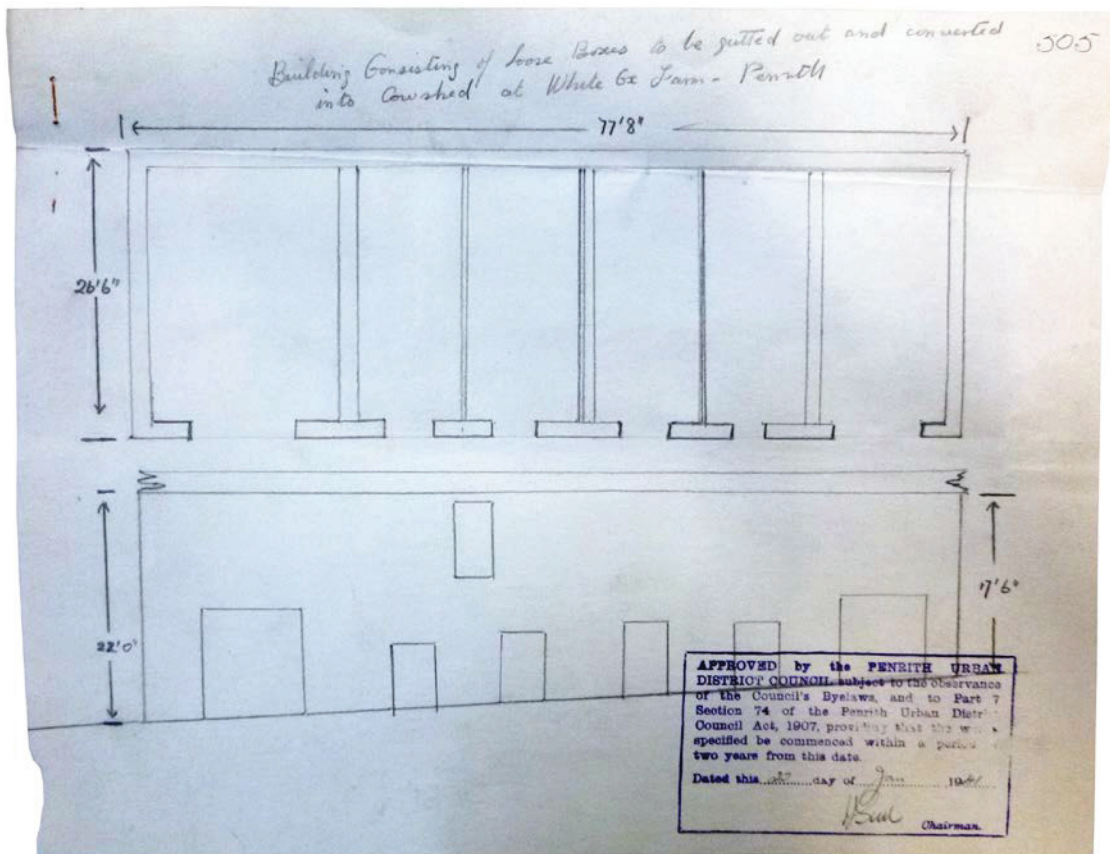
Plan and elevation of looseboxes at White Ox Farm, 1941
